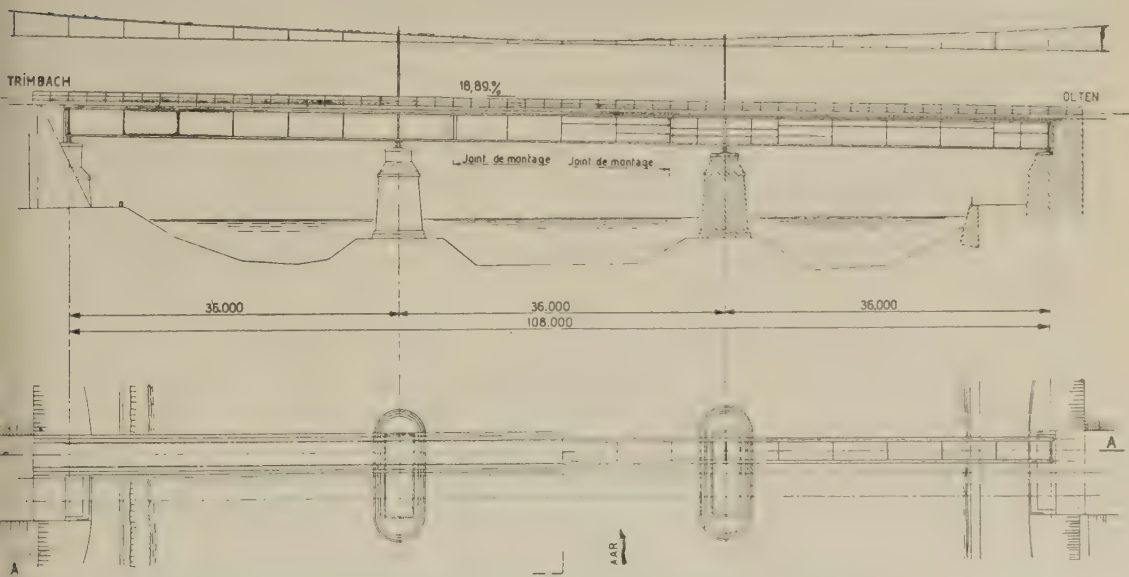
Elevation and plan of the new welded metal bridge, spanning the Aar at Olten (Switzerland).
